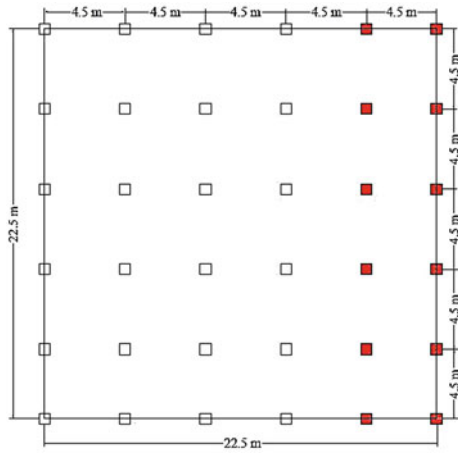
Plan for typical floor of G+3 storey RCC uniaxial asymmetric building No. 1 with 6.22% asymmetry in plan
